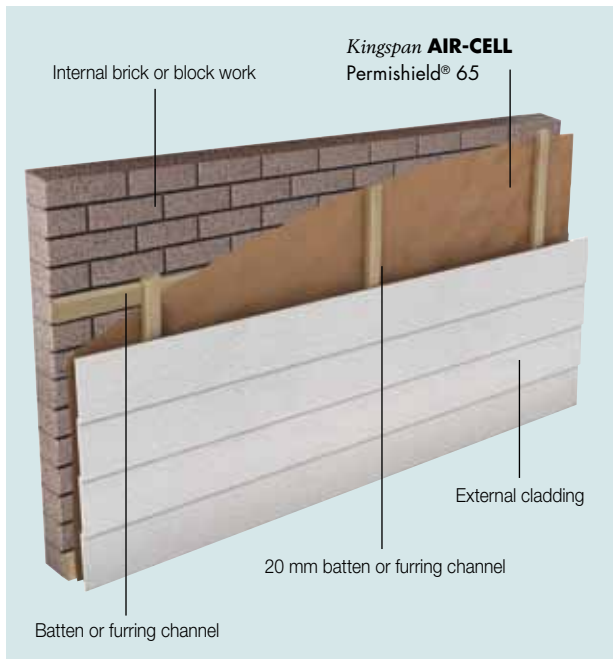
Kingspan AIR-CELL Permishield® 65 in reverse brick veneer wall installation
